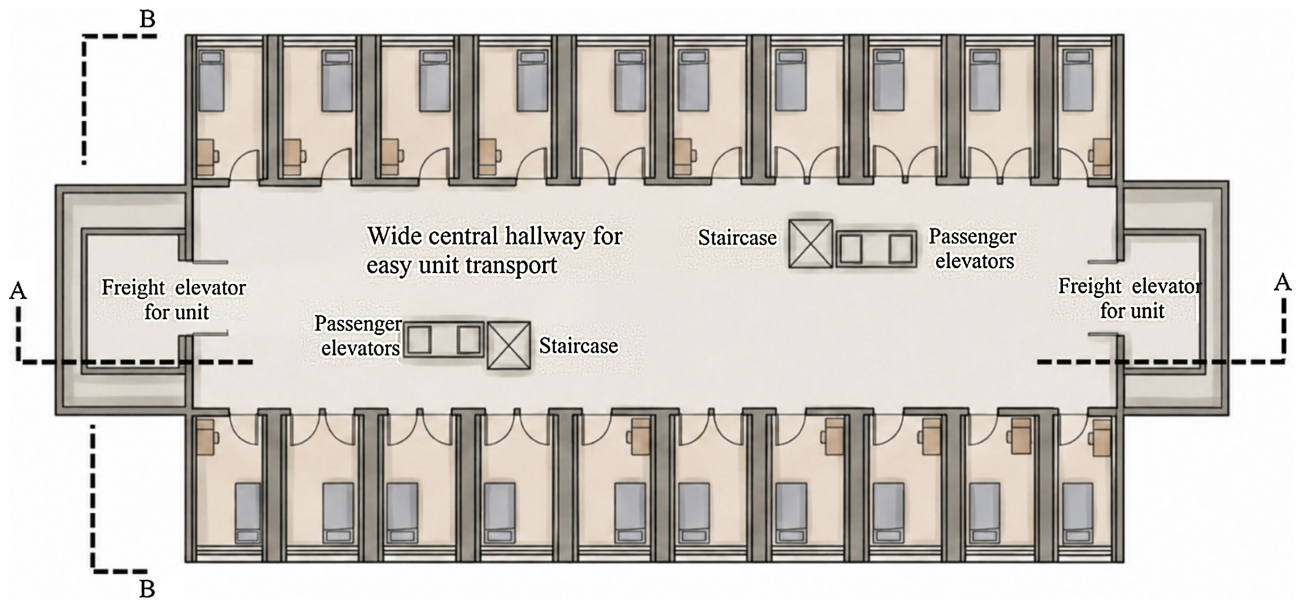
Conceptual floor plan for floors 3-12 in host structure.
